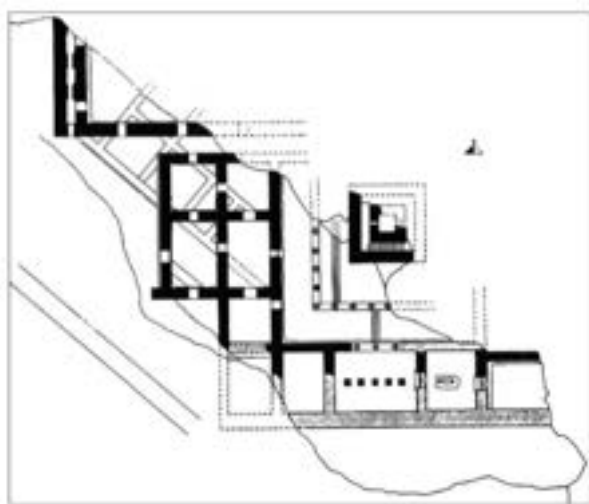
Plan and partial reconstruction of the ‘Citadel palace’ of Dura Europos by Pillet. Source: Downey 1986, fig.1.
